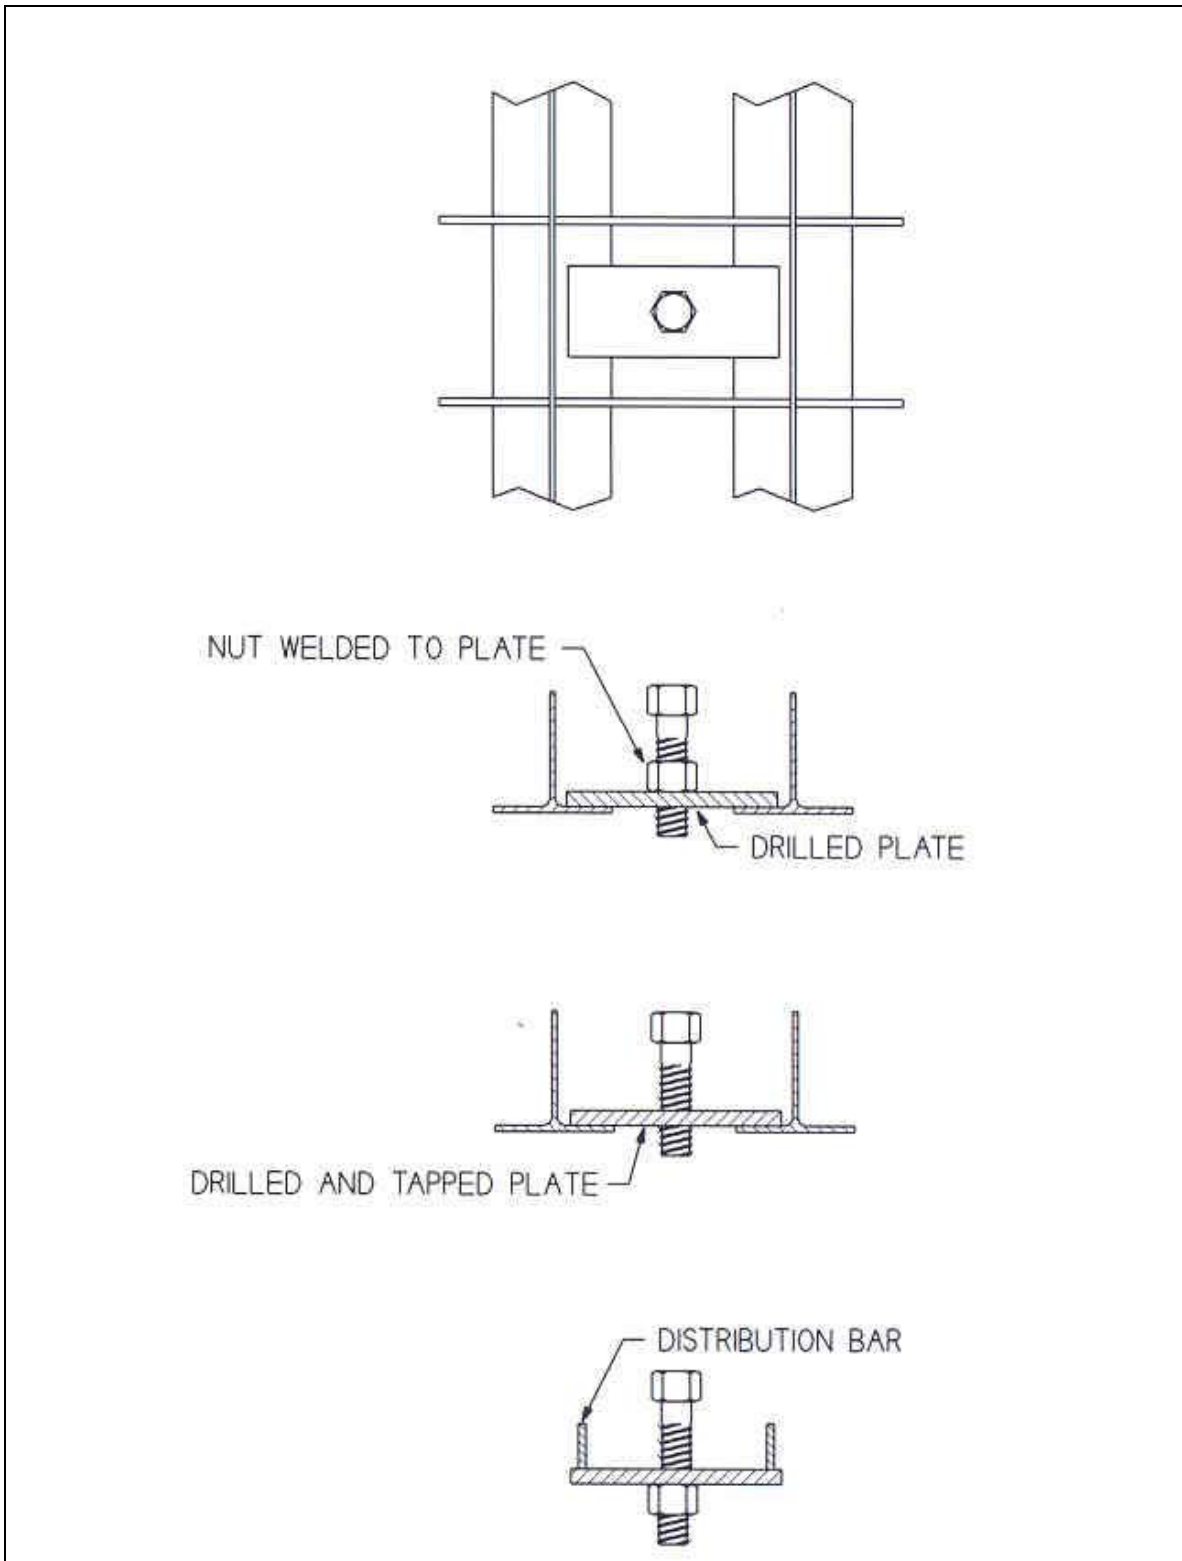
Typical height adjustment details (Exodermic Bridge Deck, Inc., 2003)
